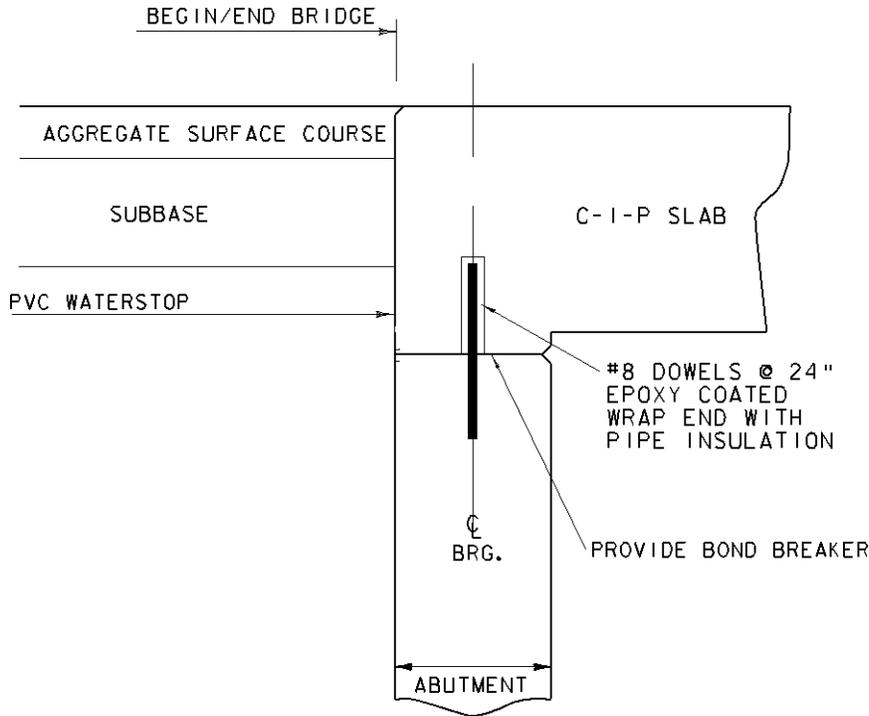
1 Cast-in-Place Concrete Slab Type D Bridge End Detail
